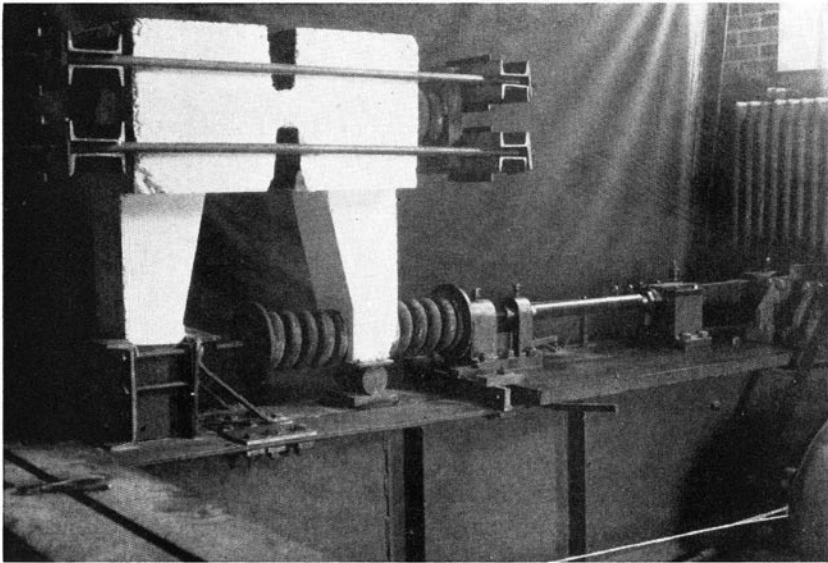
VIEW OF REPEATED ROTATION APPARATUS WITH HINGE SPECIMEN IN PLACE
